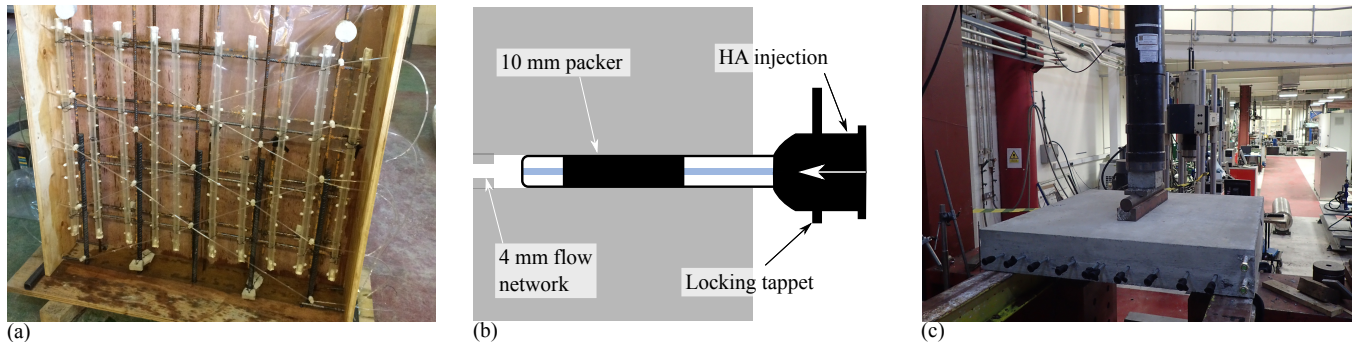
Wall panel testing arrangements (a) Wall panel part assembled prior to casting (b) Schematic of healing agent (HA) injection point (c) Wall panel loading arrangement
